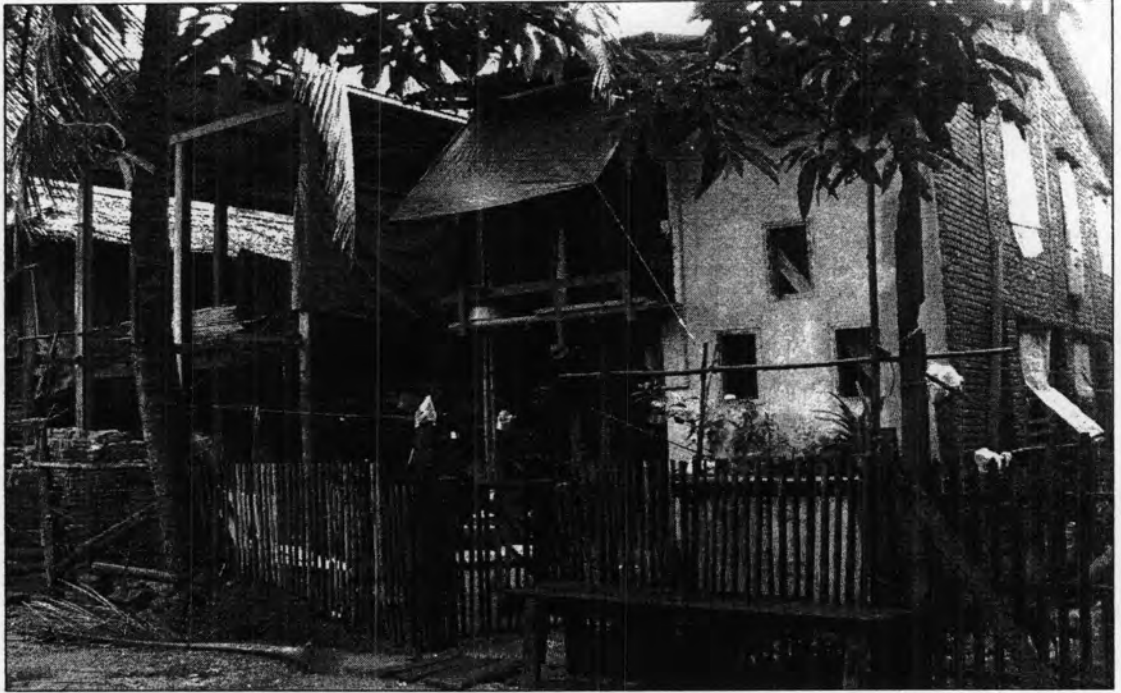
Remittances Flow to Construction of New Houses in Home Village
